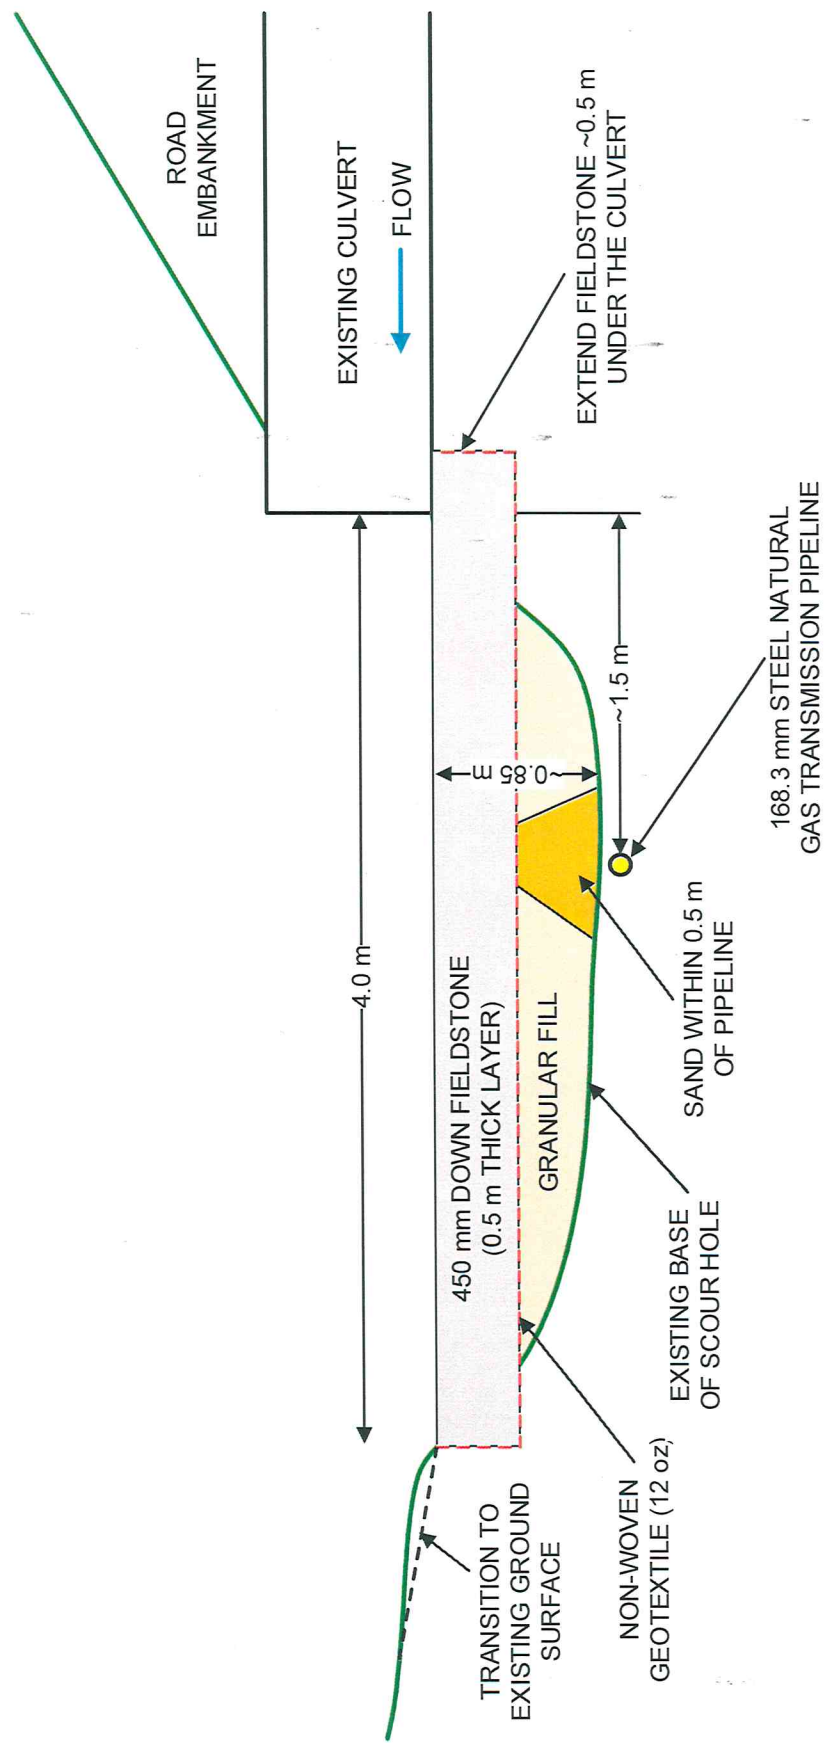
Sketch showing the typical erosion protection and infill details, section view
